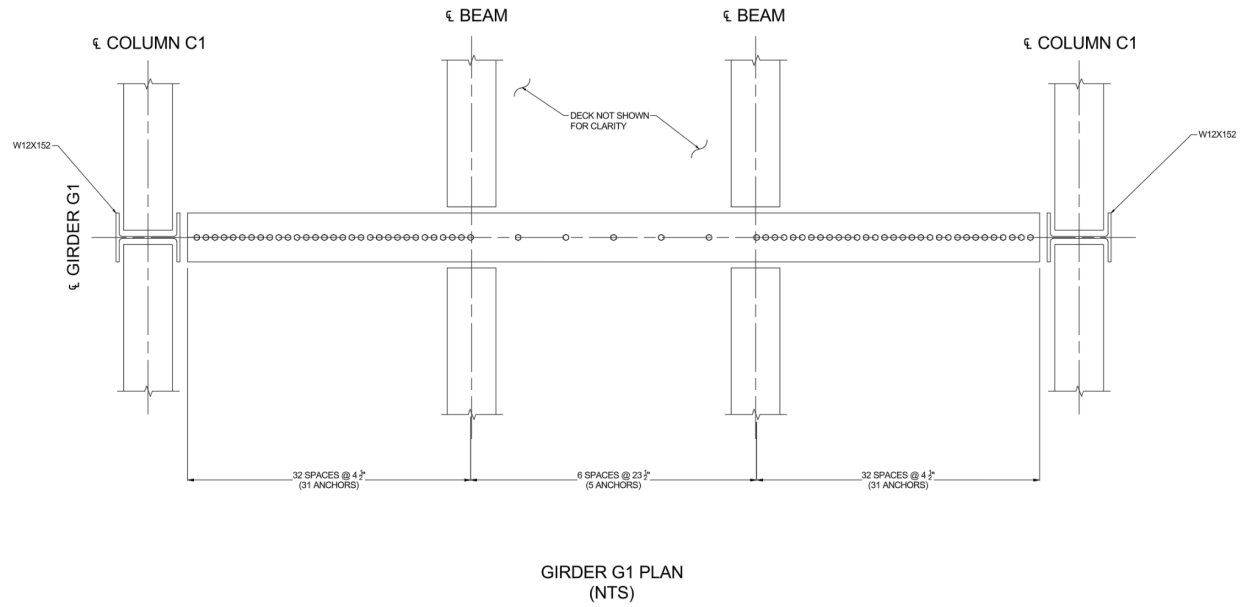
Girder G1 Steel Headed Stud Anchor Layout
